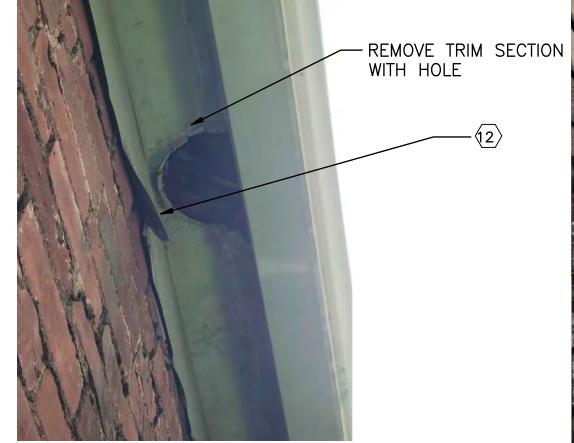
DAMAGED CLADDING AND REMOVED POST HOLE
